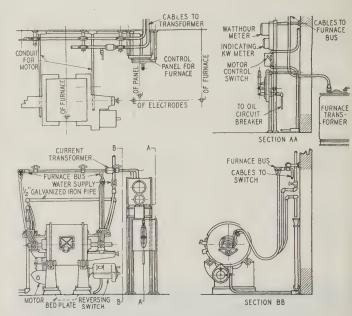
Typical installation print showing relative positions of furnace, control panel, and transfermer
